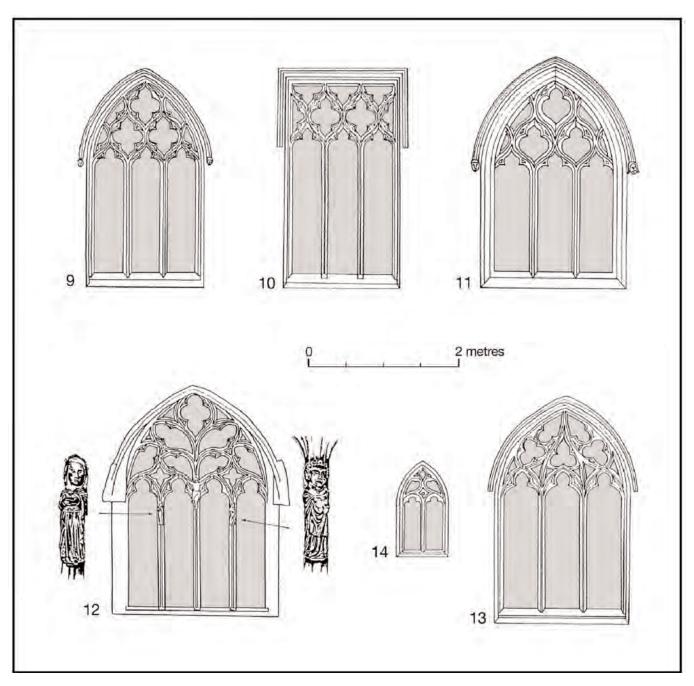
Typology of the medieval windows in St Peter's and St Mary's churches. 9, 10 St P, north aisle; 11 St M., south chancel aisle, bay 3; 12 St P, north aisle, east wall (interior); 13 St P, north aisle, west wall; 14 St M., south nave aisle, bay 1. Scale 1:50. After Bryant 2003
